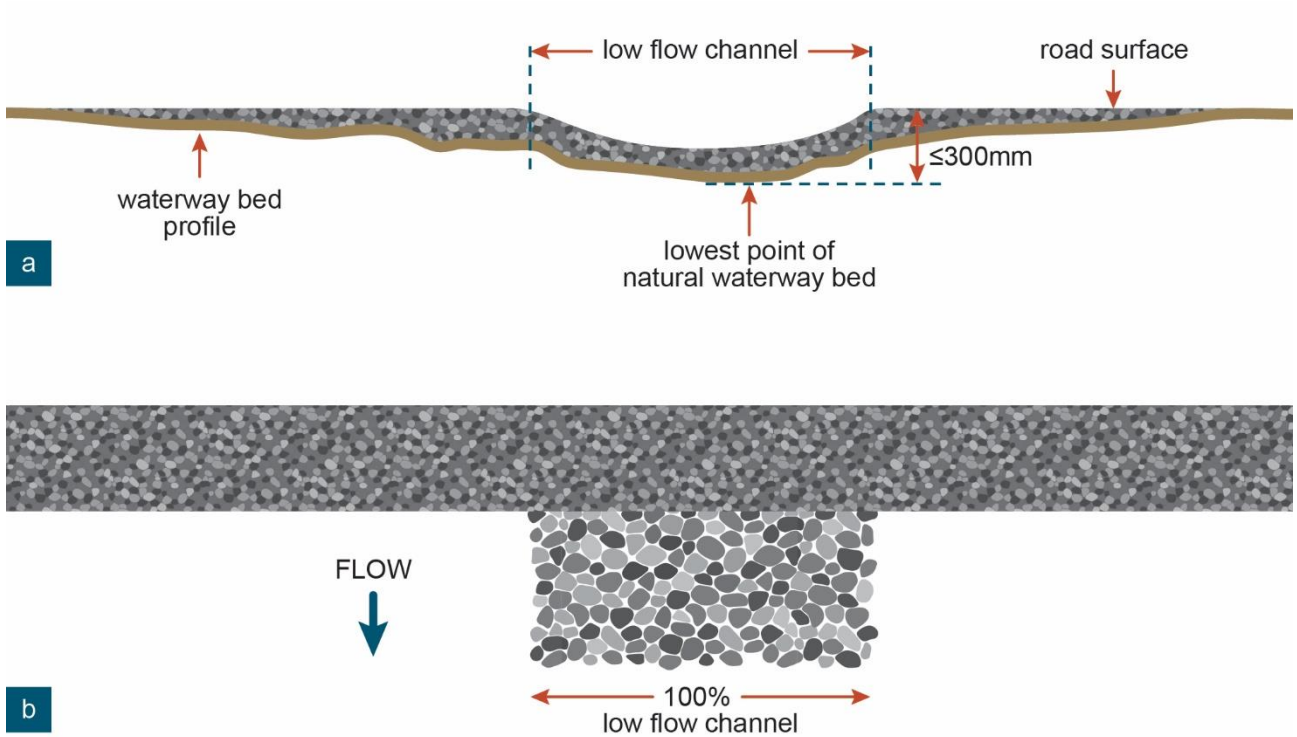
Low level crossing option 2, incorporating low flow channel – green waterway (a) cross-section of waterway (b) plan view
